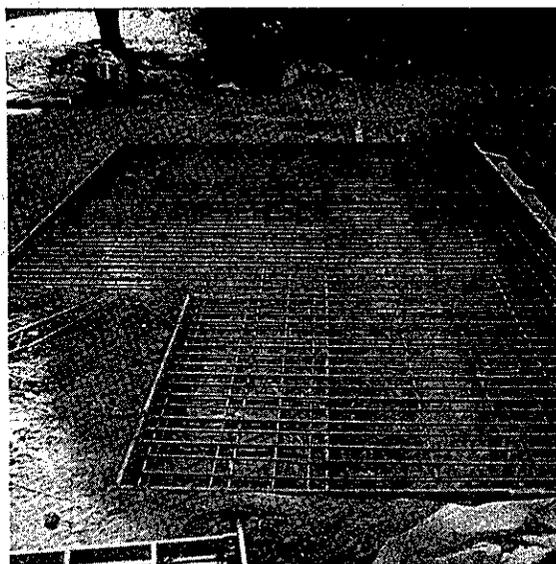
Overall view of test site prior to placing concrete for simulated bridge deck.
